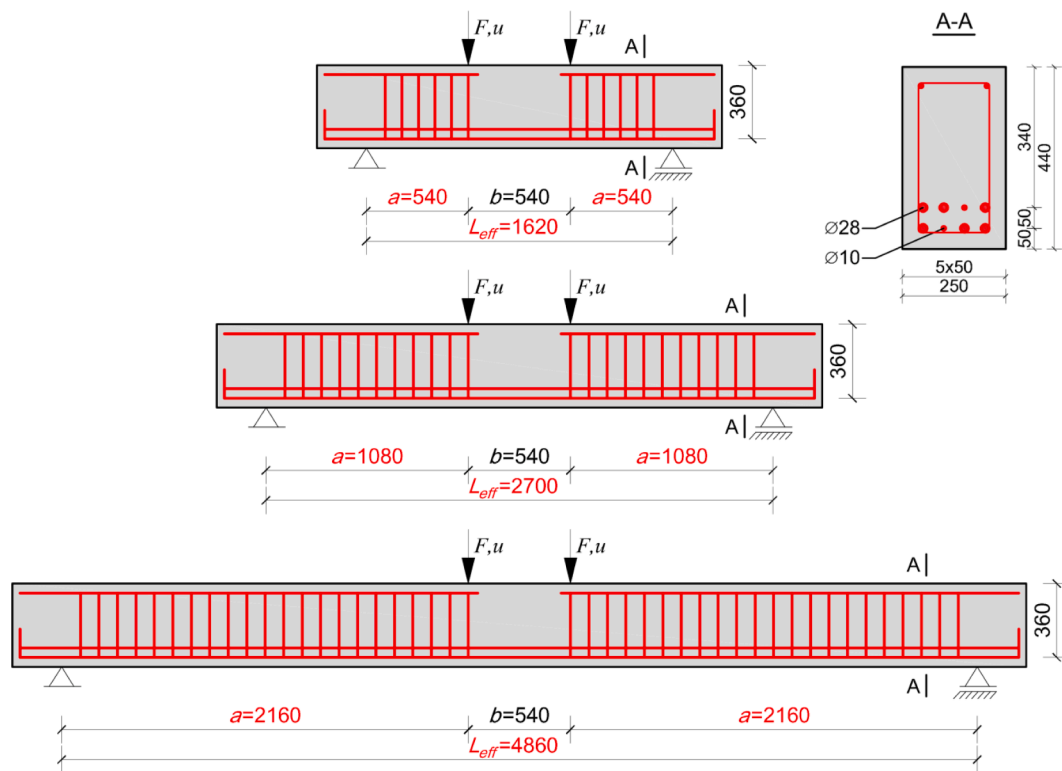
Experimental reinforced concrete beams of series '3' under four-point bending [22]: geometry, reinforcement arrangement, loading scheme and cross-section.
